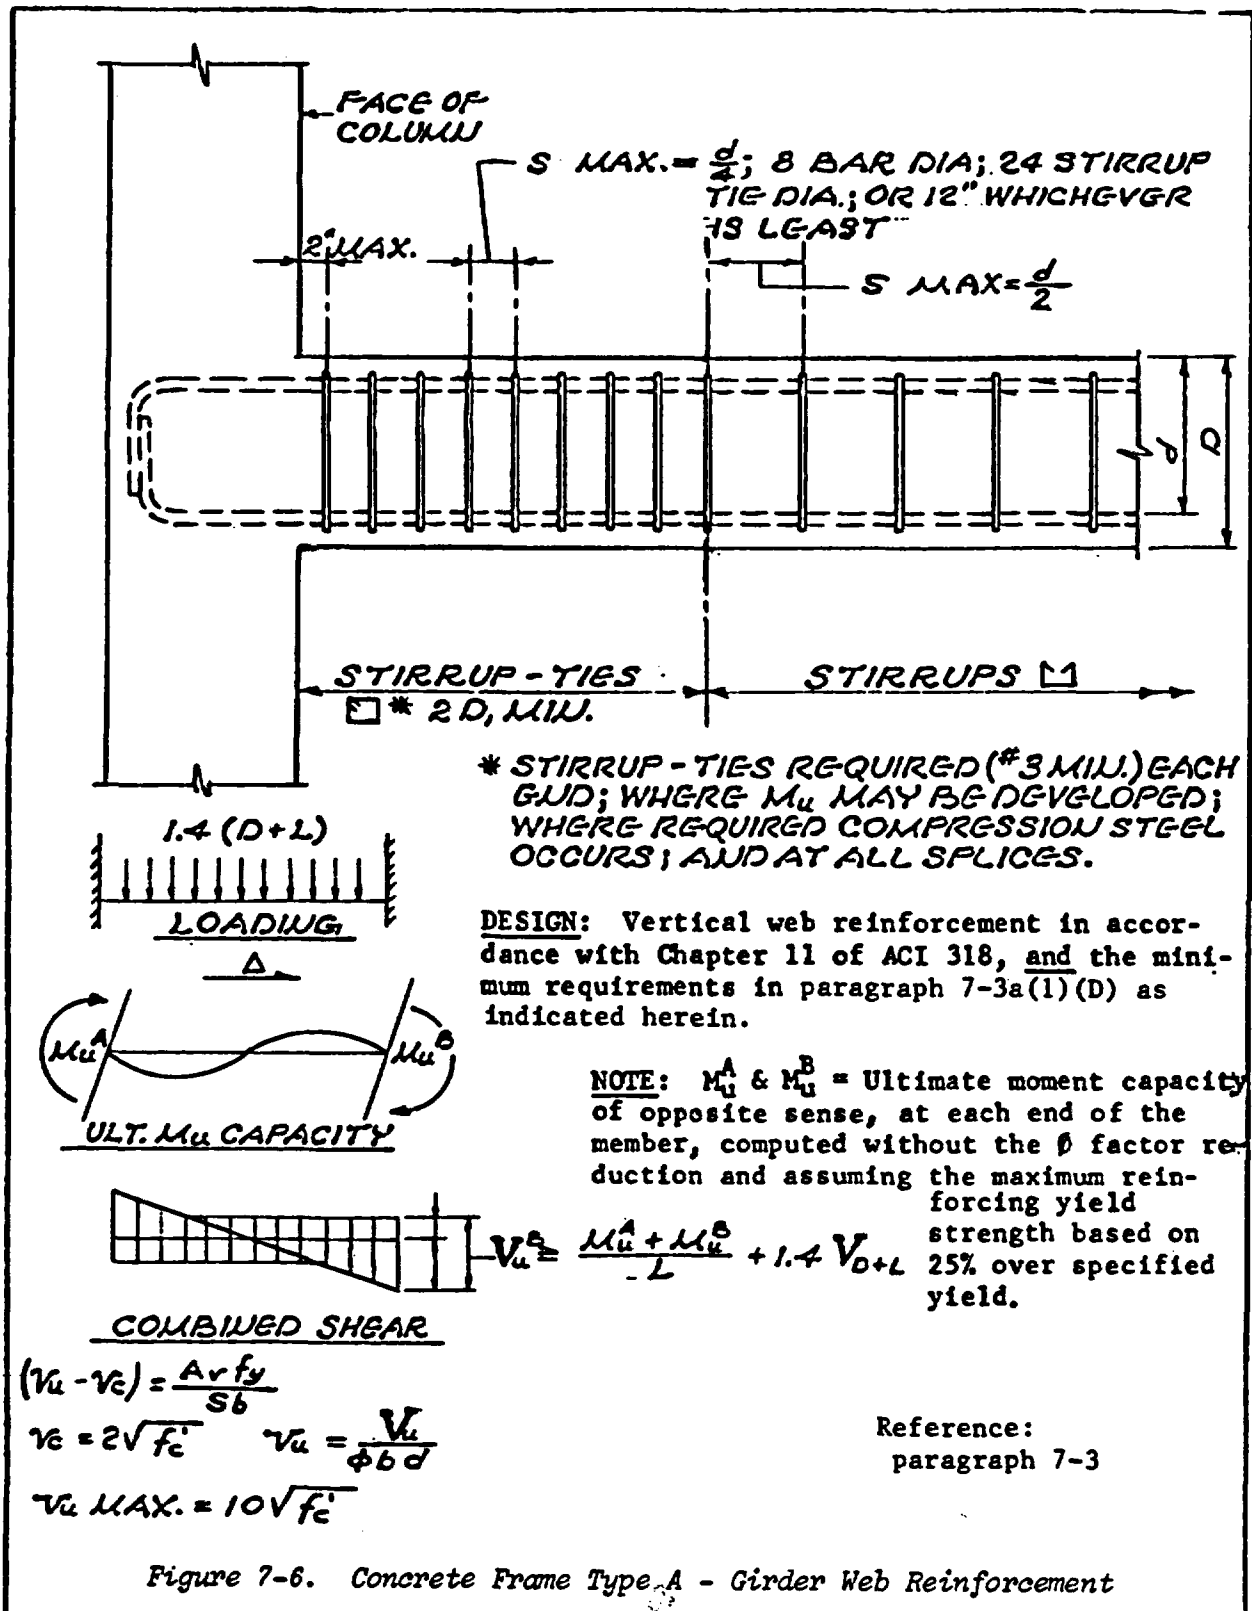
Concrete Frame Type A - Girder Web Reinforcement
